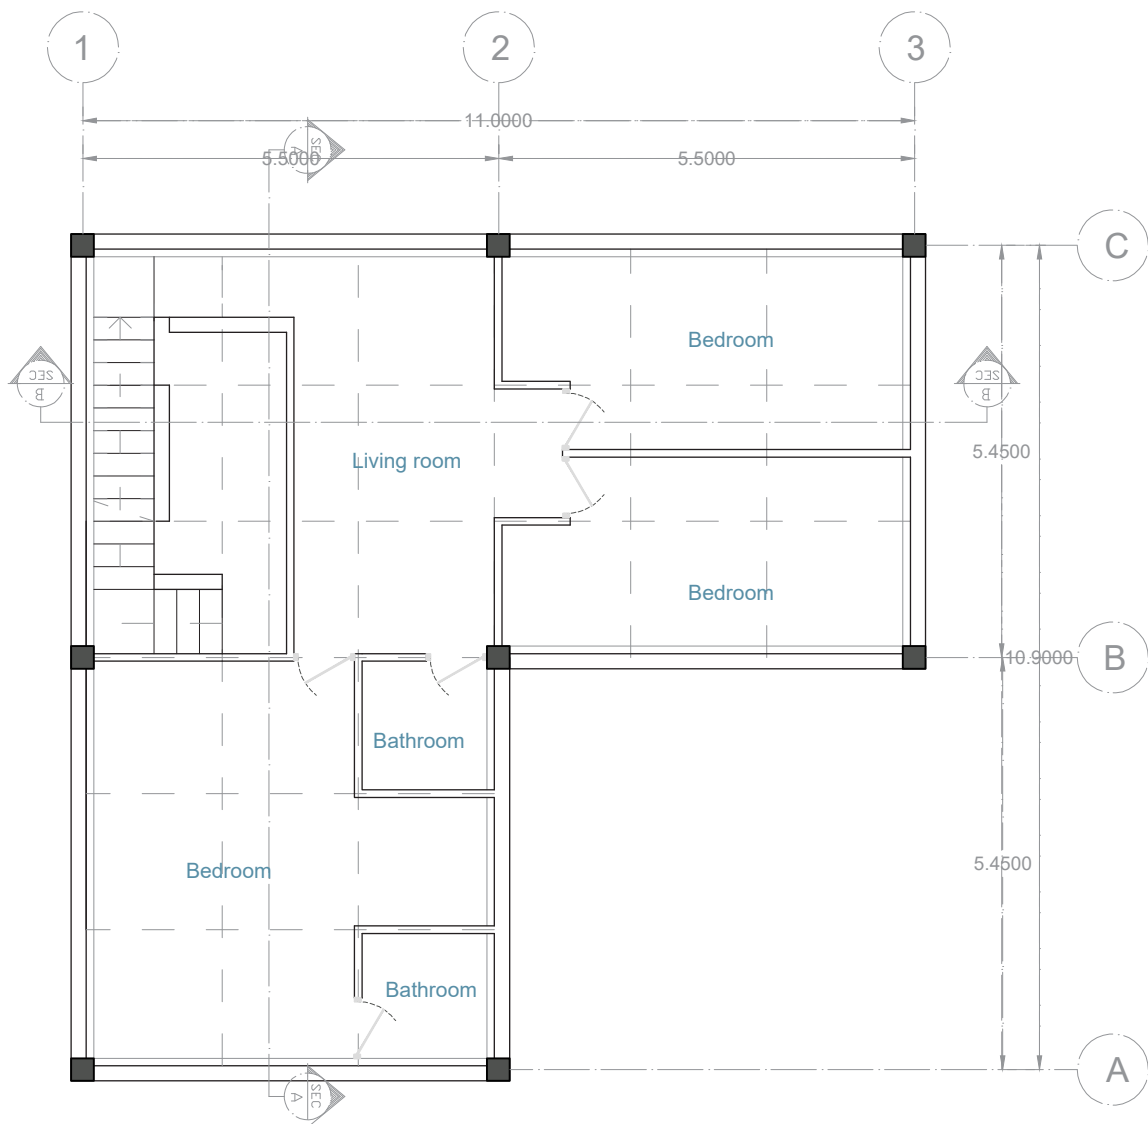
plan unit 150 m² SC 1.100 (source: author)
